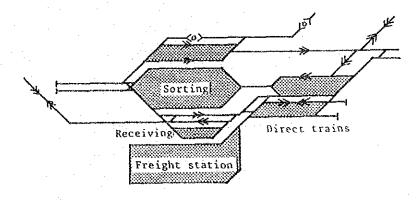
Draft Improvement Plan for Bang Sue Yard
